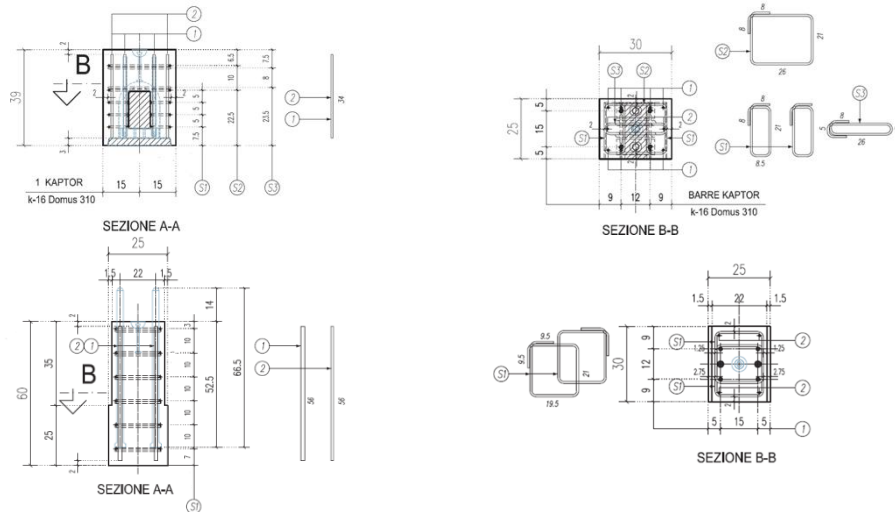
Geometry and reinforcement layout of upper and lower elements of mechanical joints.
